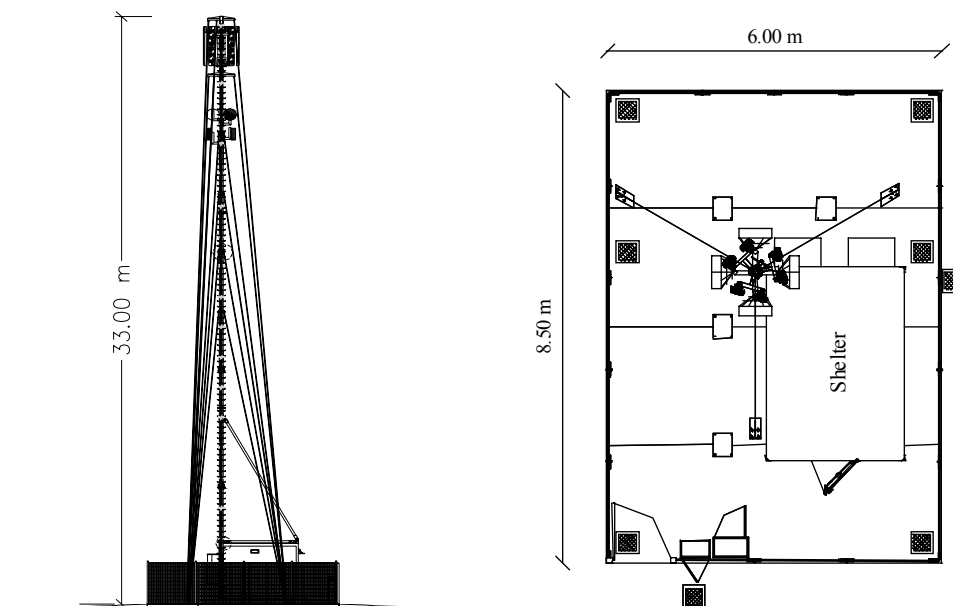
Raw land site with a cable-stayed supporting mast: (left) elevation, (right) plan view.
